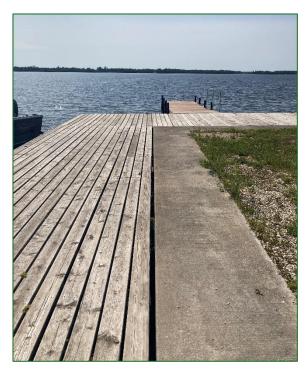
There is a significant gap between the dock and the concrete retaining wall at the LaVerendrye boat launch.
